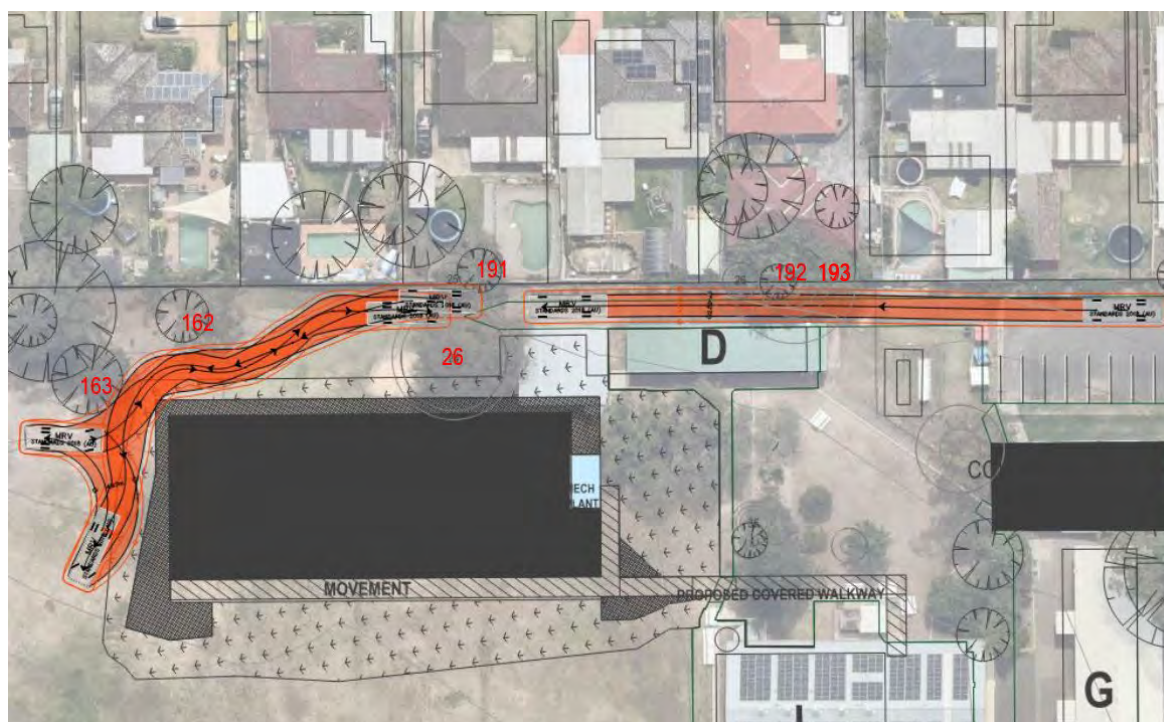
MRV Internal Circulation – Construction Traffic Management Plan. TTW, April 2025.
